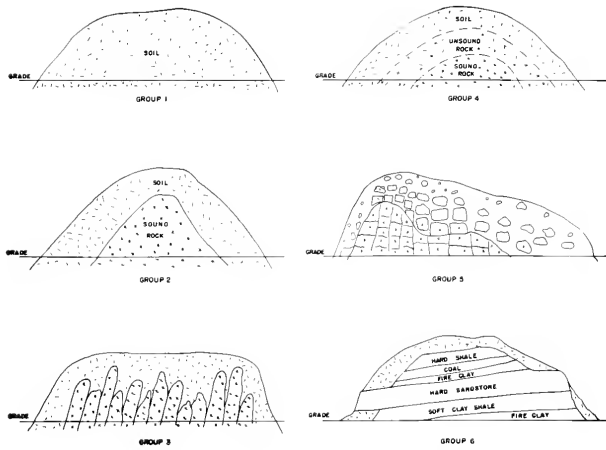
SIX SHALLOW EARTH SURFACE CONDITIONS
